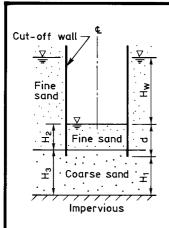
Penetration of Cut-off Wall to Prevent Hydraulic Failure in Homogeneous Sand (after NAVFAC, 1982a)
